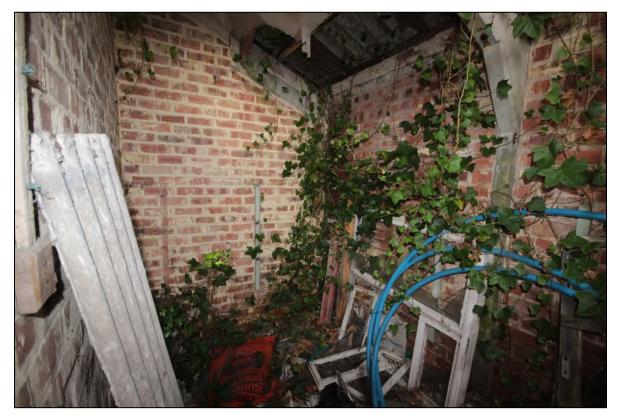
View of the stud walling within the eastern extent of Building 1's southern wall, taken with 2m scale facing west (File: HBR\_54)
